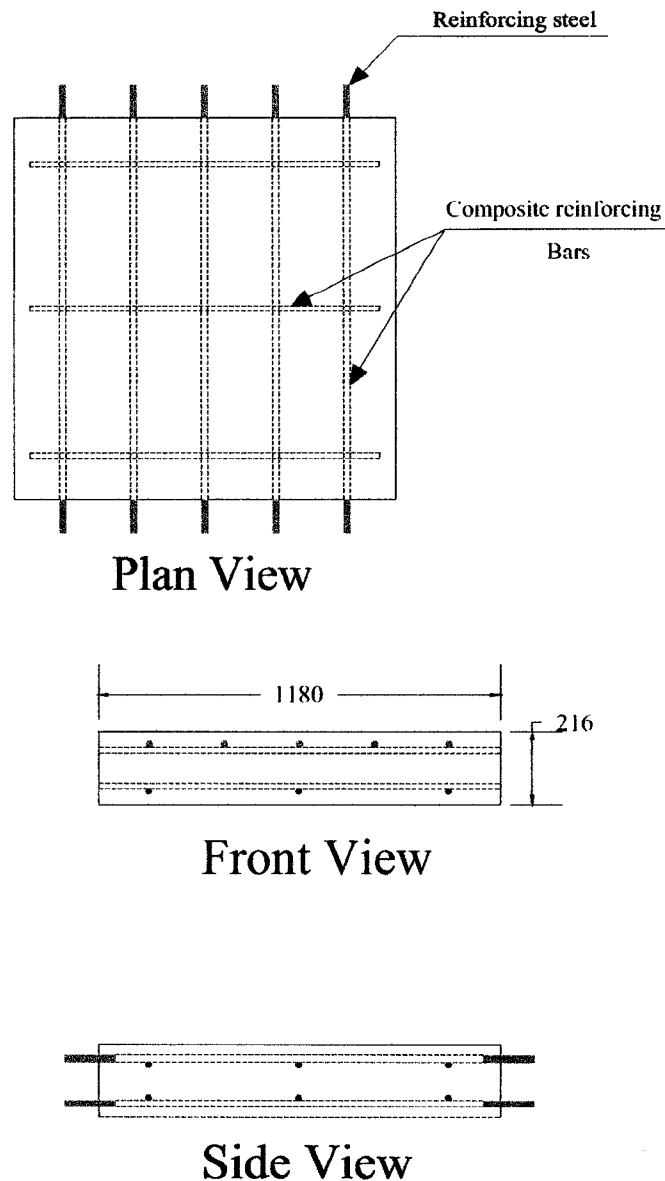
Dimensions and steel rebar positions in specimens tested by Liu and Weyers (1998)
